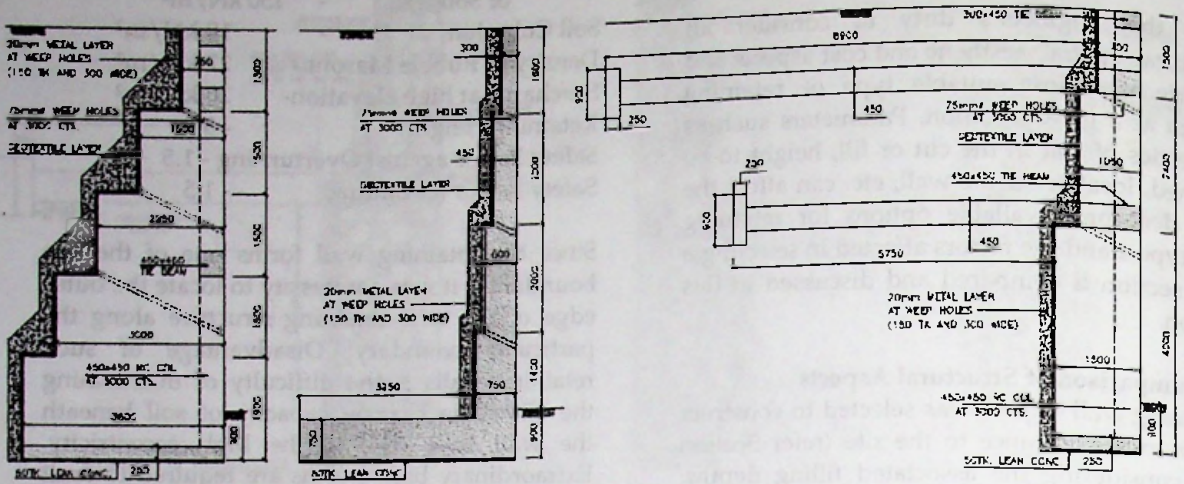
Possible Retaining Wall Types to Retain 5m Fills
